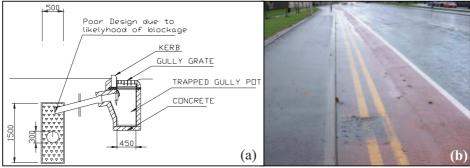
Road side filter drain arrangement (a); Flooding due to blocked gully outlets (b)
